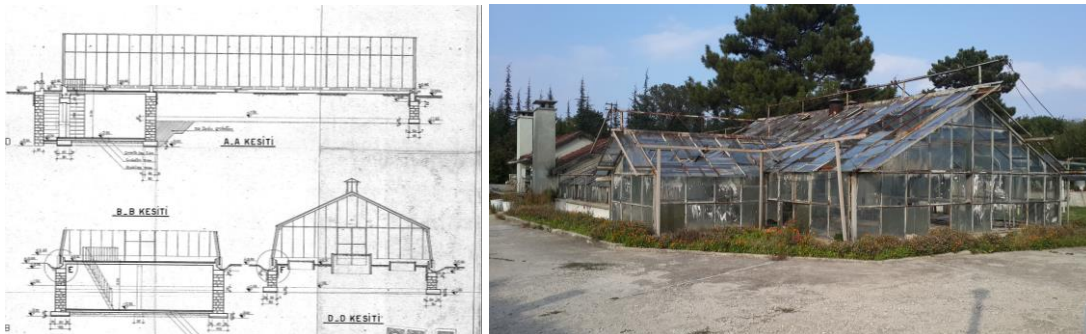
Sections drawn in 1961 and photo taken in 2014 of the Green House Buildings
